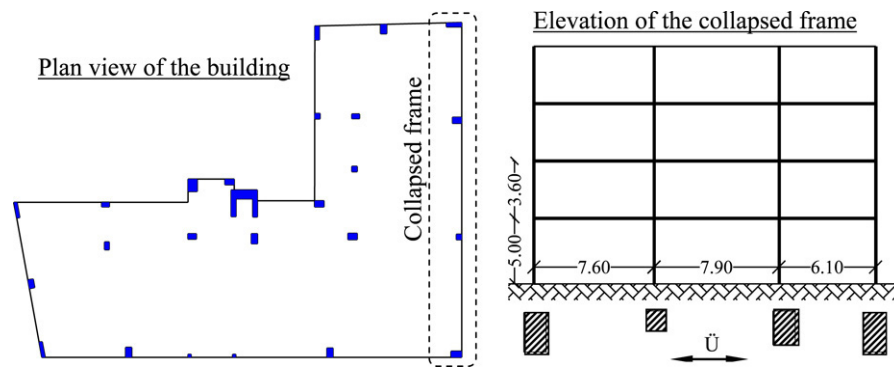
Plan view of the building and elevation plan of the collapsed frame.
